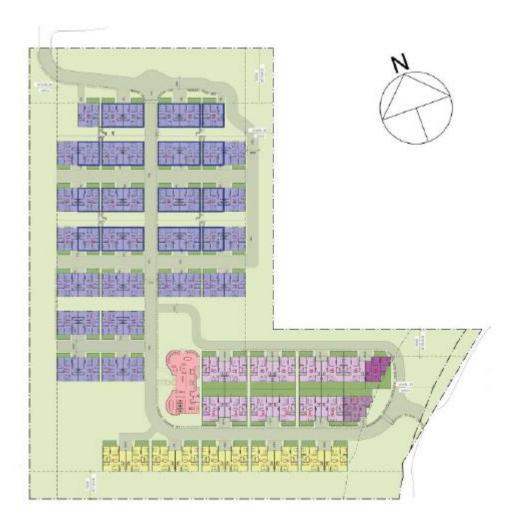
Proposed site plan (two-storey dwellings are outlined in dark blue).
